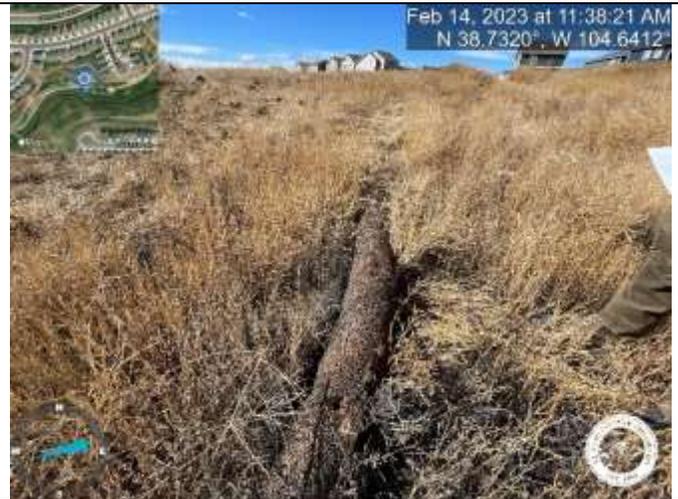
Pond CR3: Remove temporary control measure straw wattle from along the access road.
